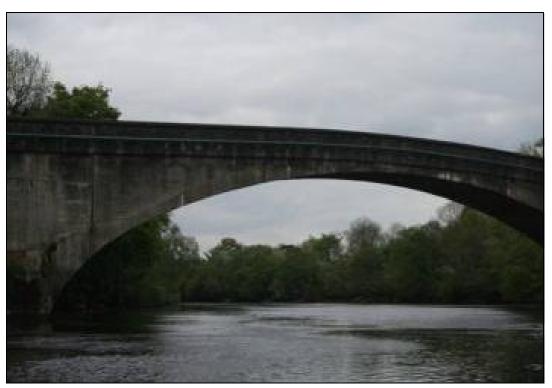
Tailrace Canal Crossing, Parteen Bridge
